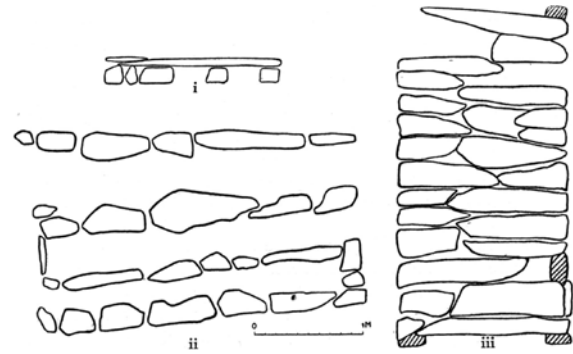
Thermi, platform in area  $\Delta$ , town II (i section, ii plan of substructure, iii plan of platform)
